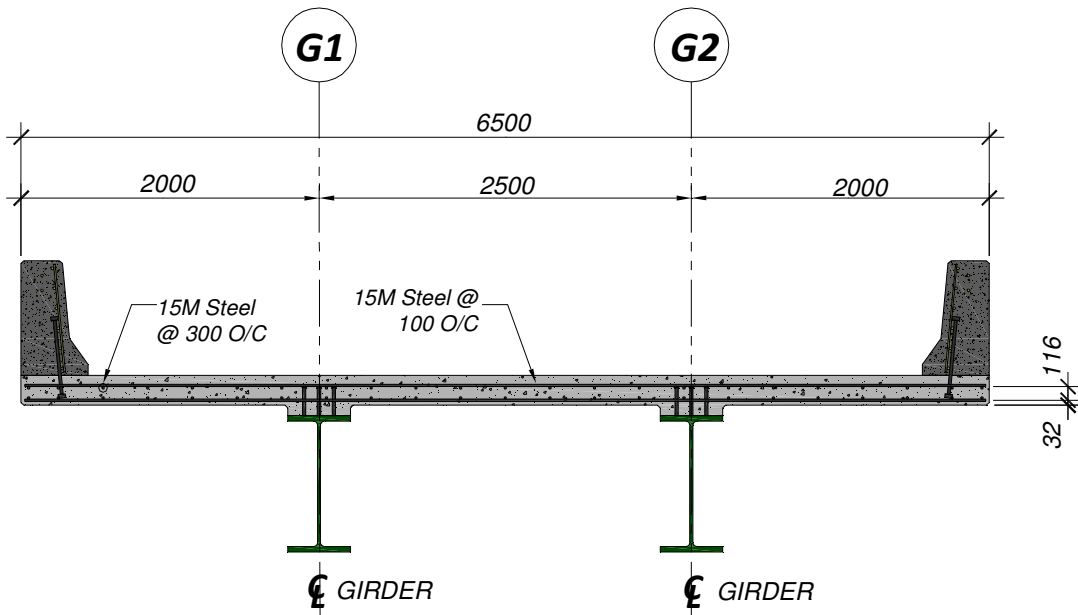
(e): Typical cross section illustrating the top reinforcement details for the section with steel reinforcement (Cross section “E” from Figure 3-9(a))
